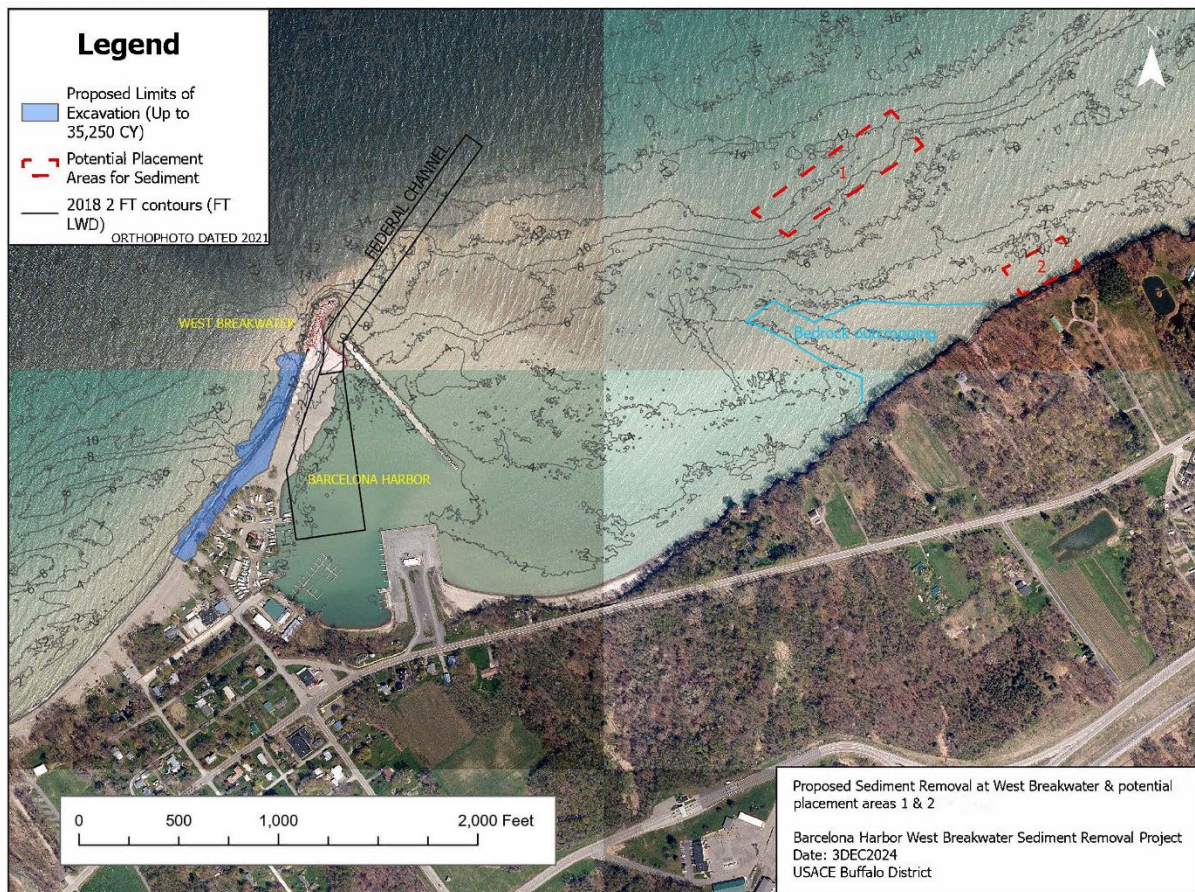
Barcelona West Breakwater Potential Placement Areas 1 & 2
